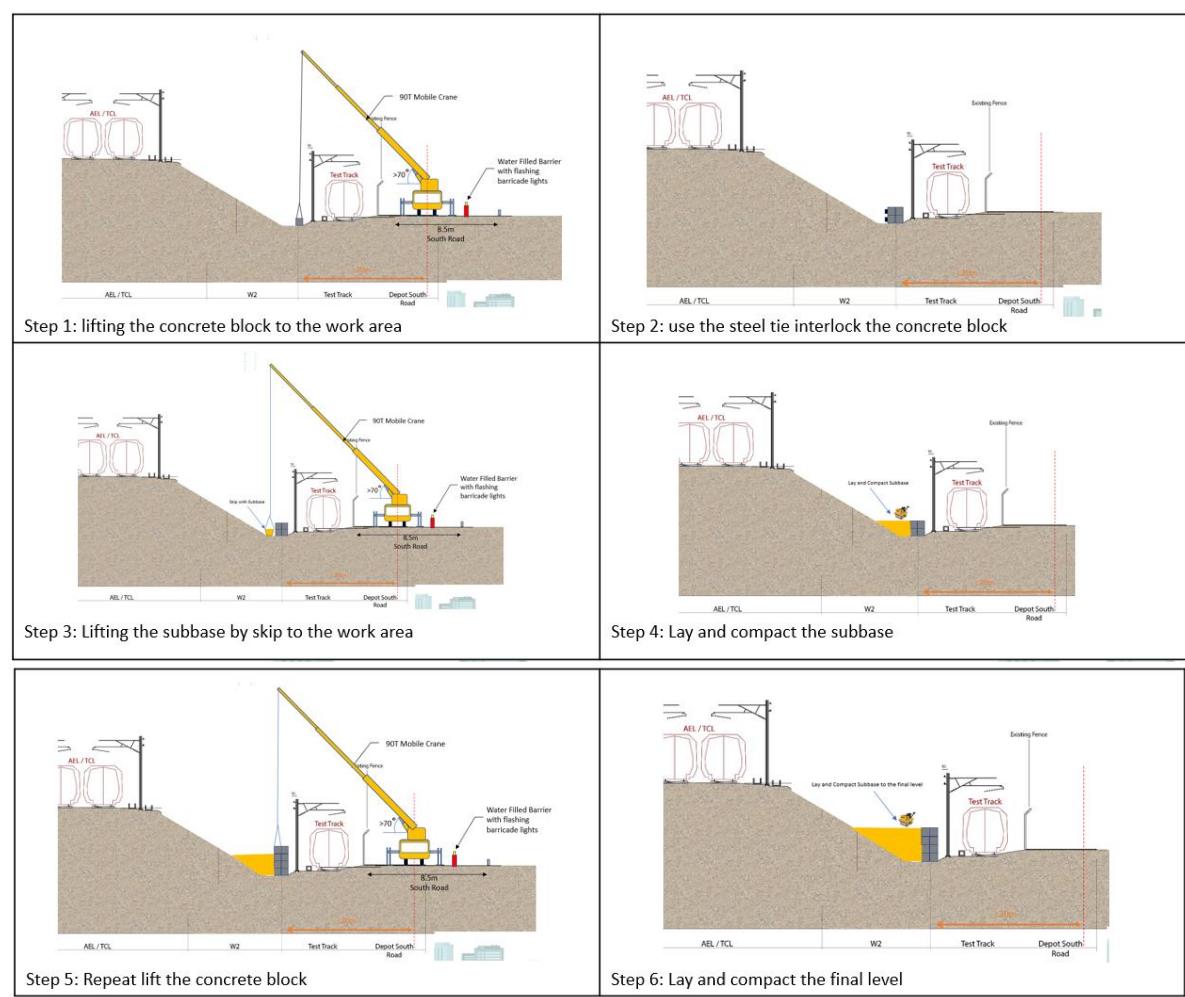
Detailed Construction Sequence for Working Platform
